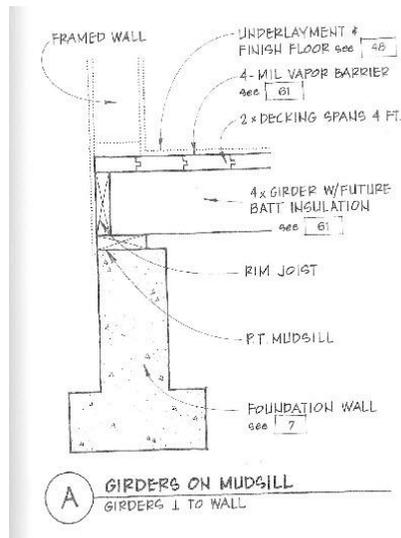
Girder Placement on Foundation (Thallen, 2000)
